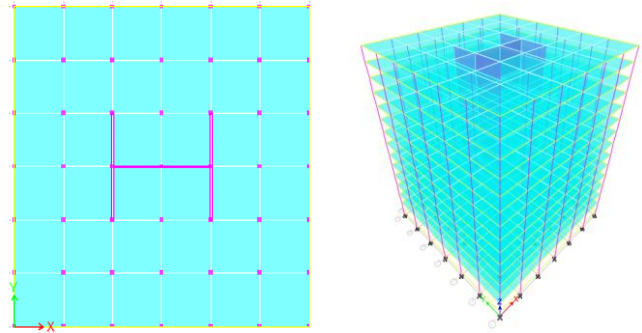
Plan and 3-D View of Model with H-Shaped Shear Wall
